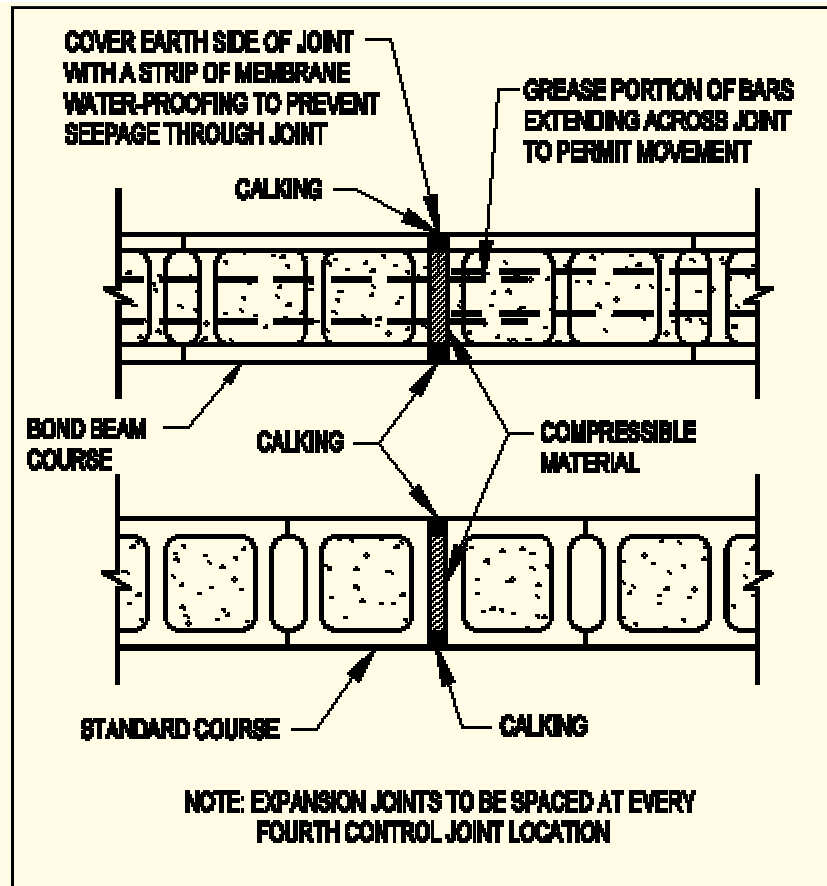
TYPICAL EXPANSION JOINT DETAIL
